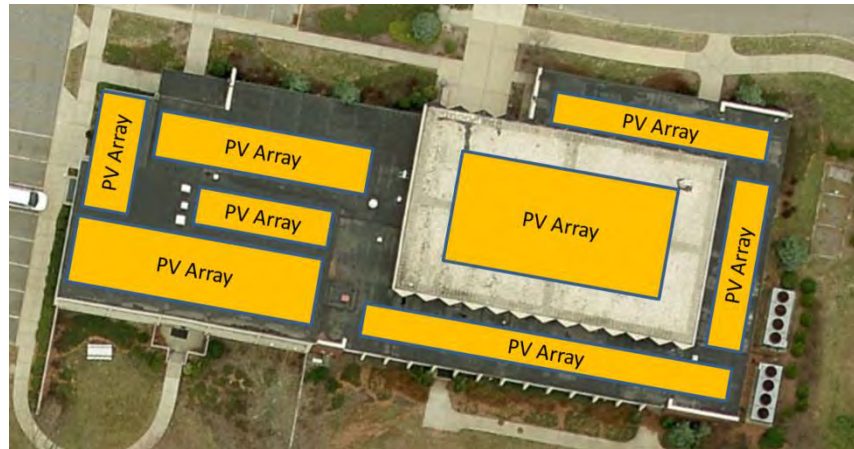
Roof of Legislature Building with possible PV array arrangement.
